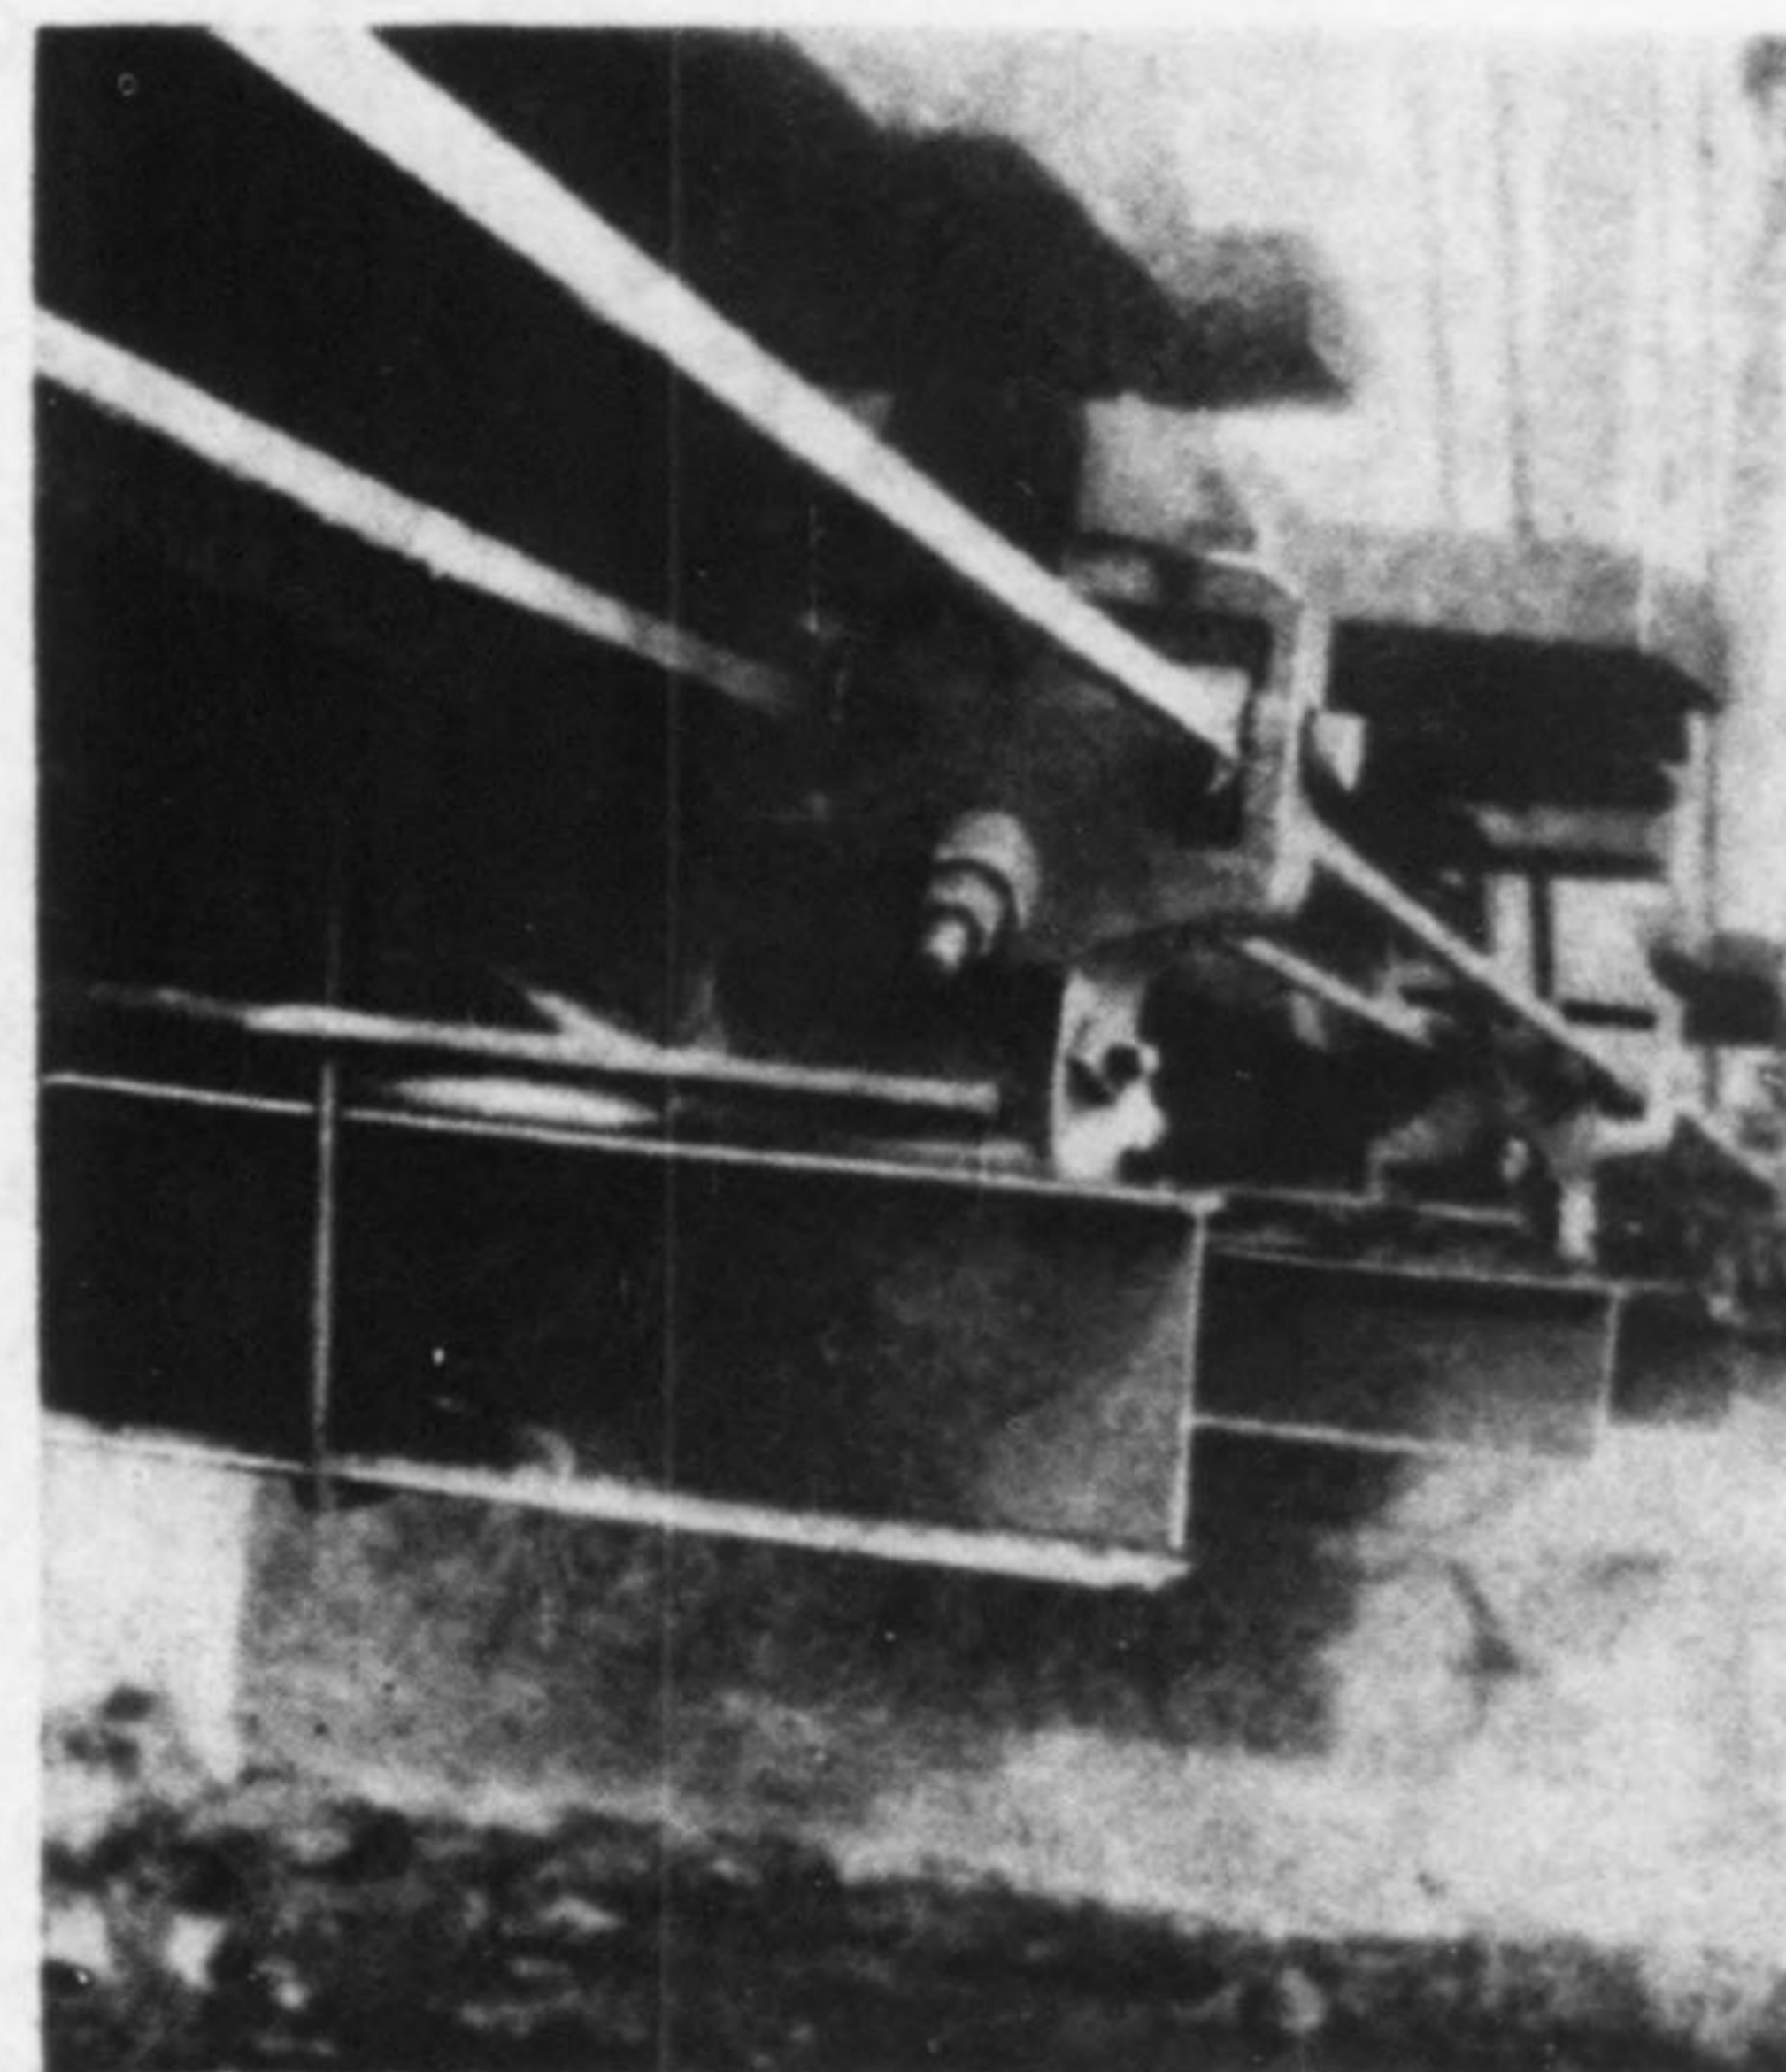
Bottom panel-point detail of continuous-type cast-iron bridge. Note steel I-beams used to reinforce old cast-iron floor beams.
